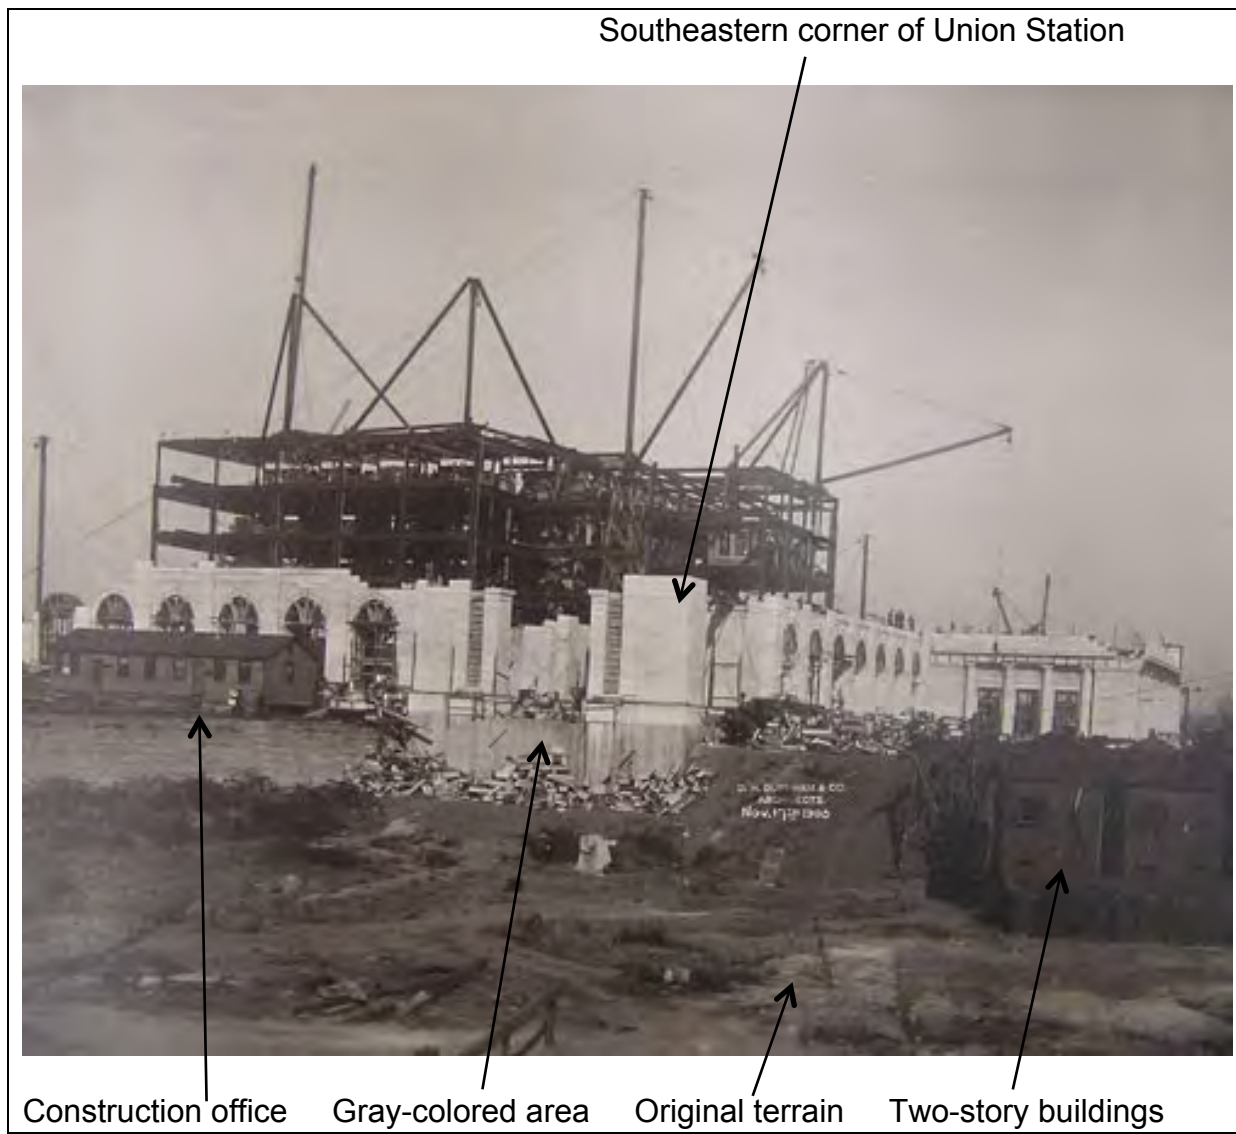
Union Station under construction, late 1905 (Library of Congress)
